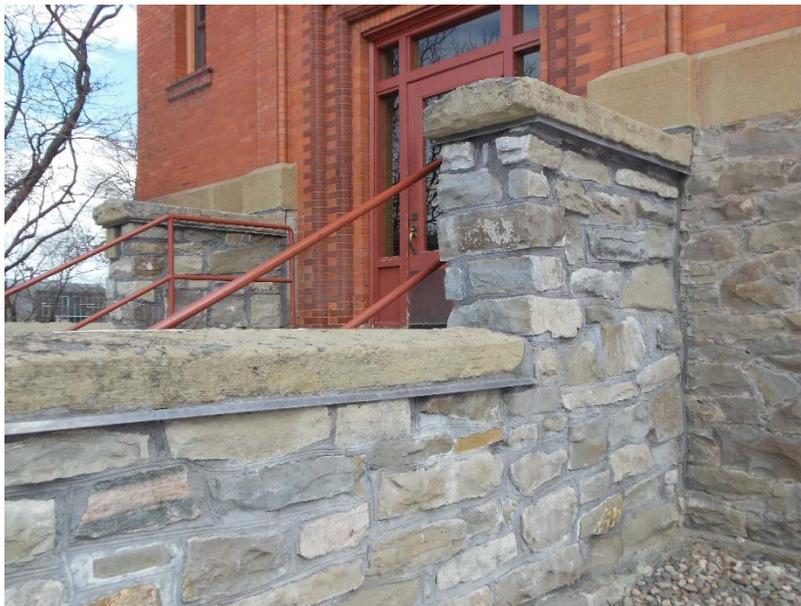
Montana Hall (24GA1879) west entrance exterior stairs. Source: Victoria Drummond, 2016
